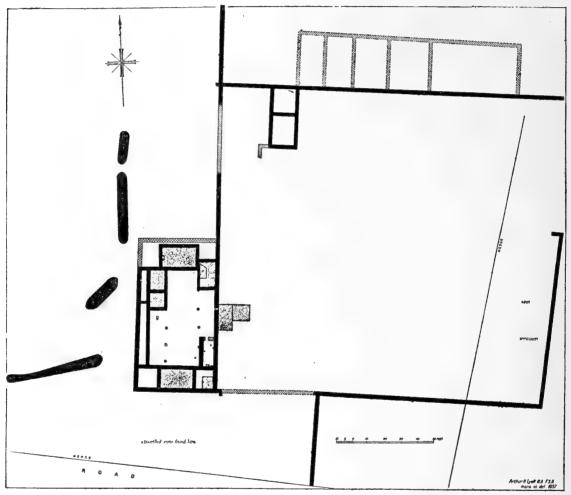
PLAN OF A ROMAN HOUSE AT CLANVILLE, ANDOVER.
